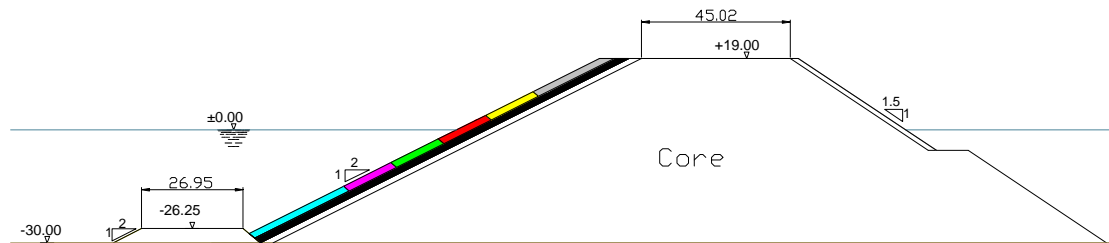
Cross section of the double-layer cube armored model (prototype dimensions in m.).
